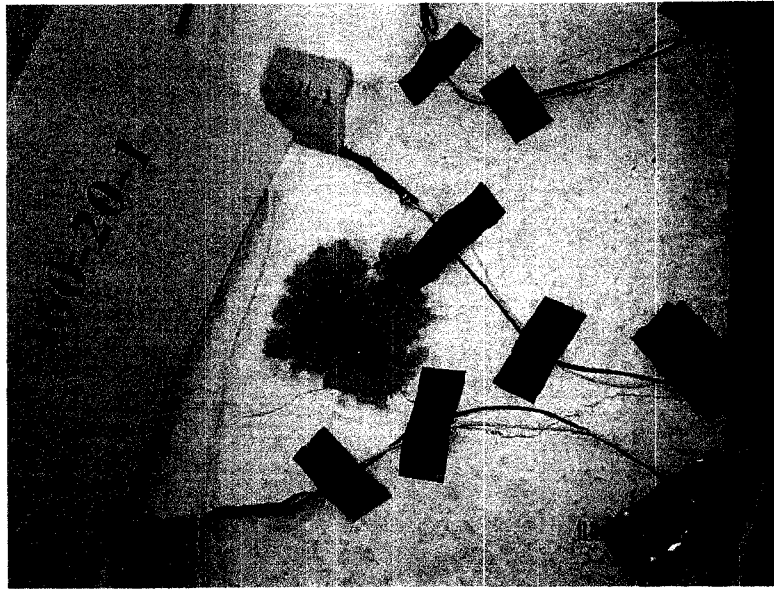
Top view of specimen SG460-20-1 showing cracks 1 and 2 and leaching of rust
